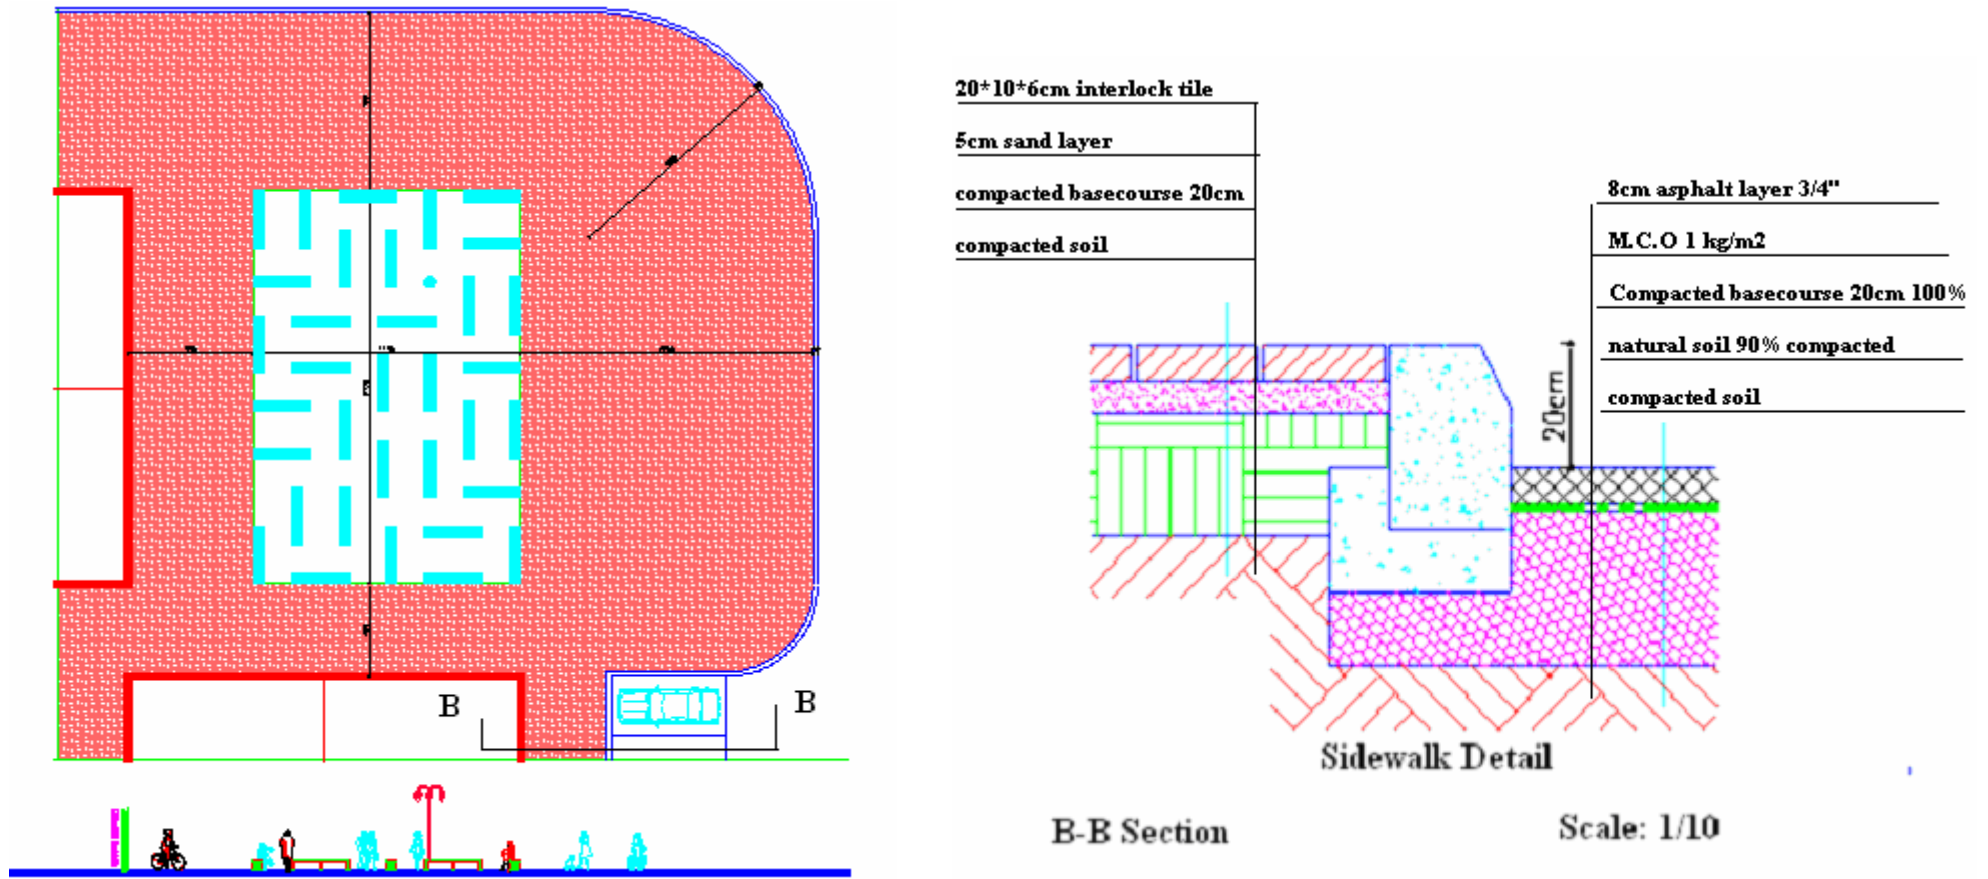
Detail of sidewalk Pavement and sitting area pavement
